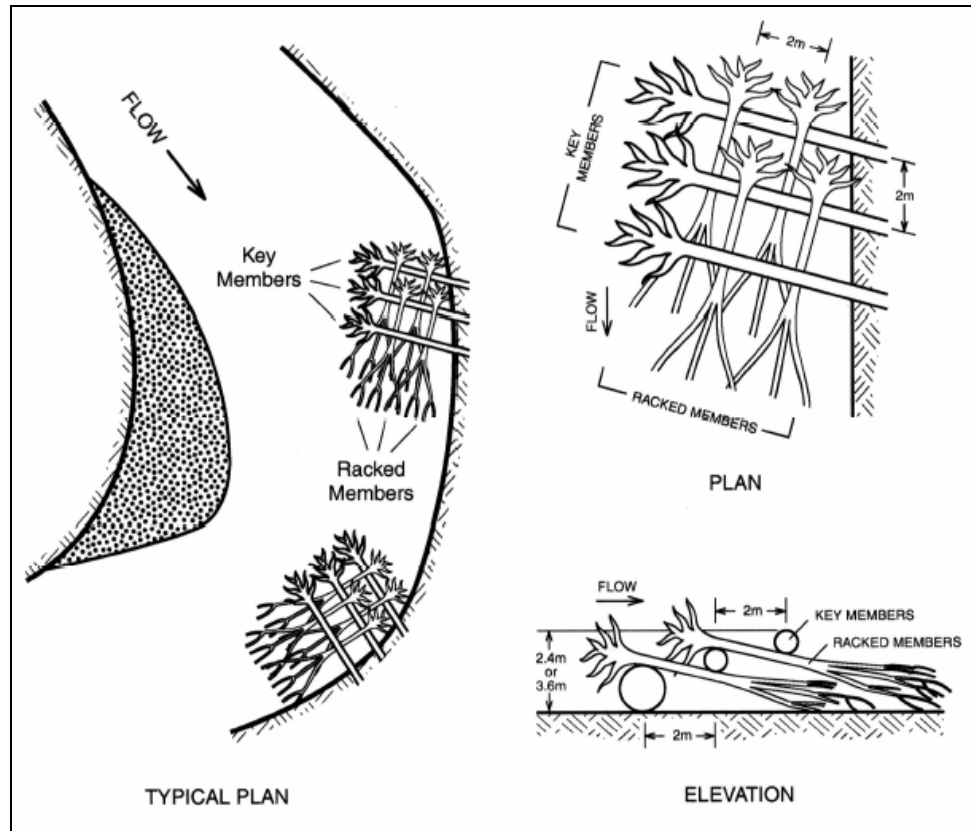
Typical plan and elevation for large wood structures (Shields et al., 2001)
